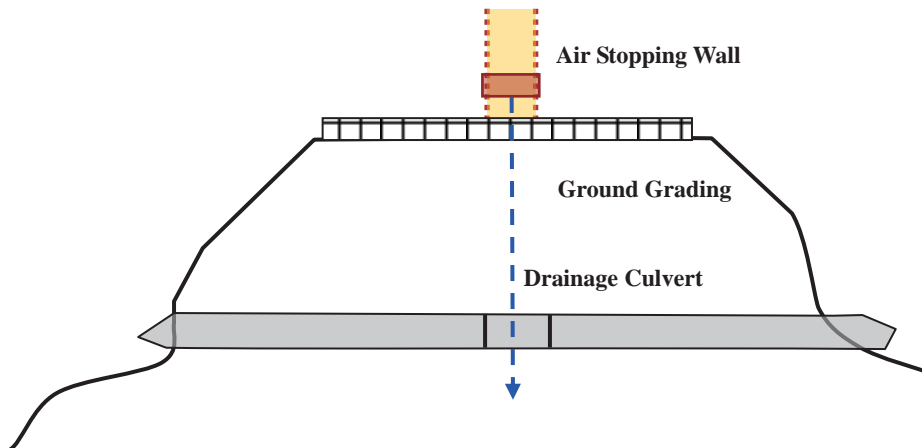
An Example of Improvement for Abandoned Pit at Mchenga Coal Mine
